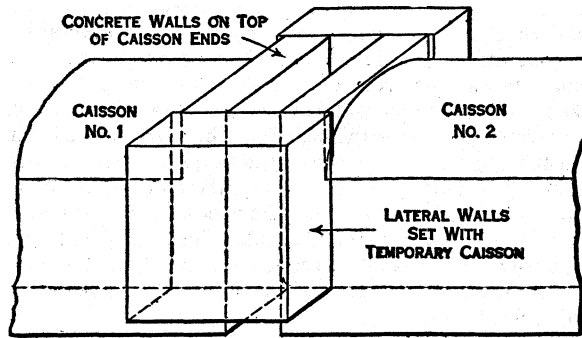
PERSPECTIVE SHOWING MANNER OF ENCLOSED SPACE BETWEEN TUNNEL CAISSONS FOR THE METROPOLITAIN UNDER THE SEINE AT PARIS
